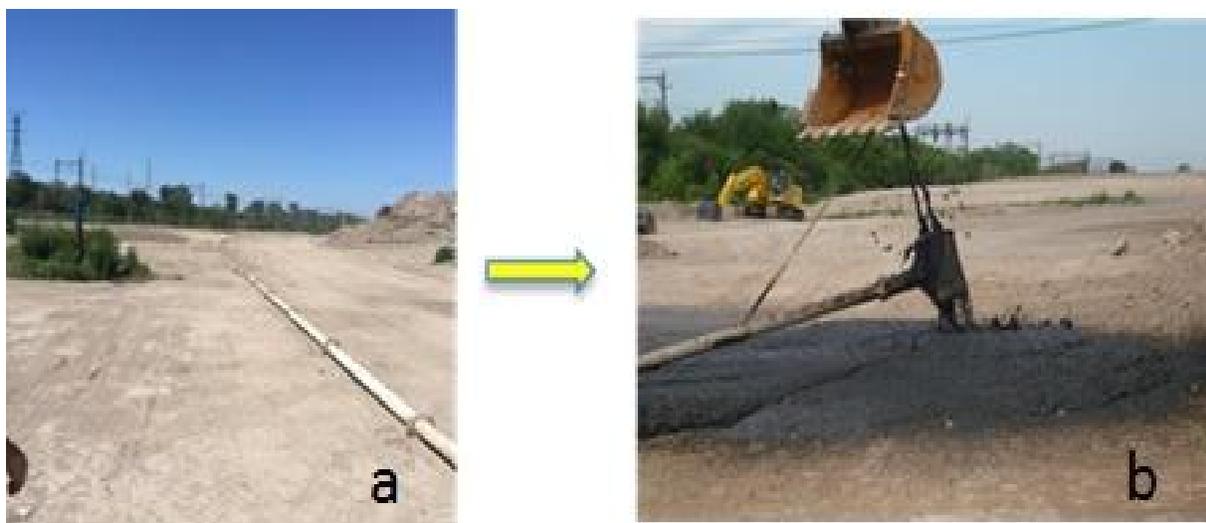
(a) PTFM mixing pipe (b) discharge of stabilized material from pipe
